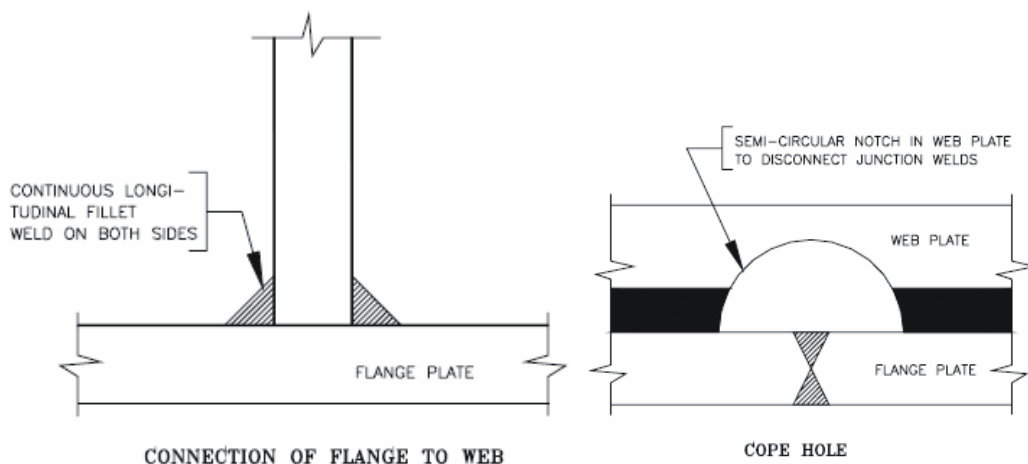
Cope hole at the junction of web-flange weld and the flange splice
